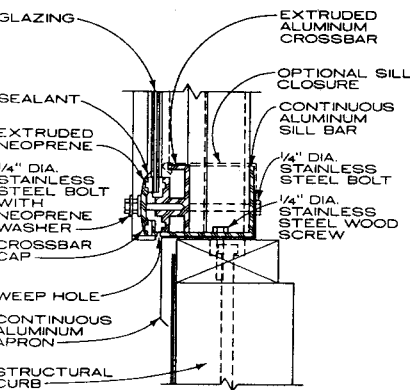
DETAIL C: TYPICAL TUBULAR ALUMINUM FRAMING
